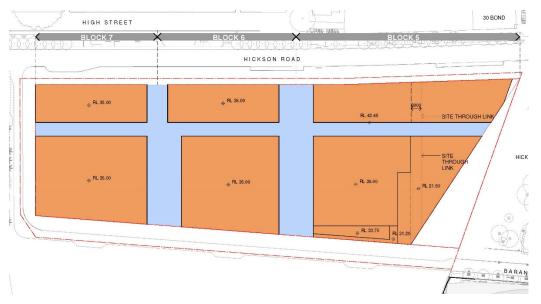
MOD 9 - RtS Central Barangaroo building envelope plan view. Source: SJB, 2023.
